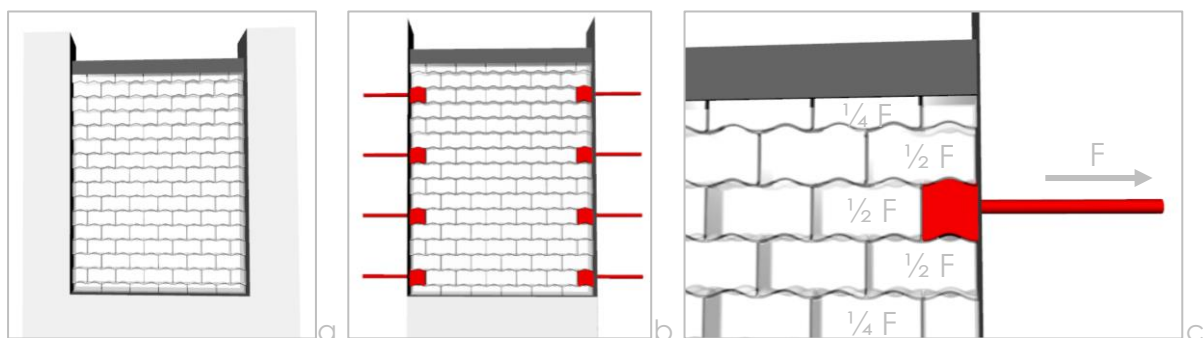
Wall structure principle, a) cast glass interlocking masonry wall example; b) highlighted anchors at a certain spacing in the brickwork; c) close-up of the top anchor and keystone with force partitions conveyed through the shear locks.
